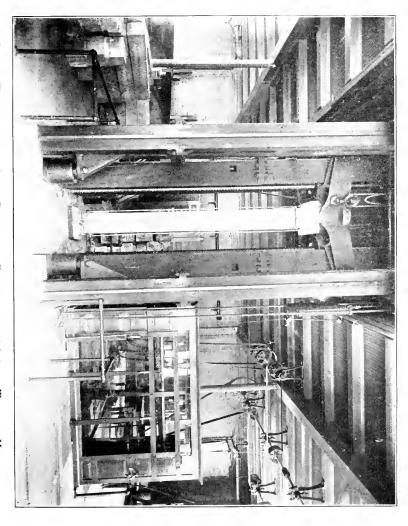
Testing 12 x 12 in. Concrete Column in 600,000-lb. Testing Machine
